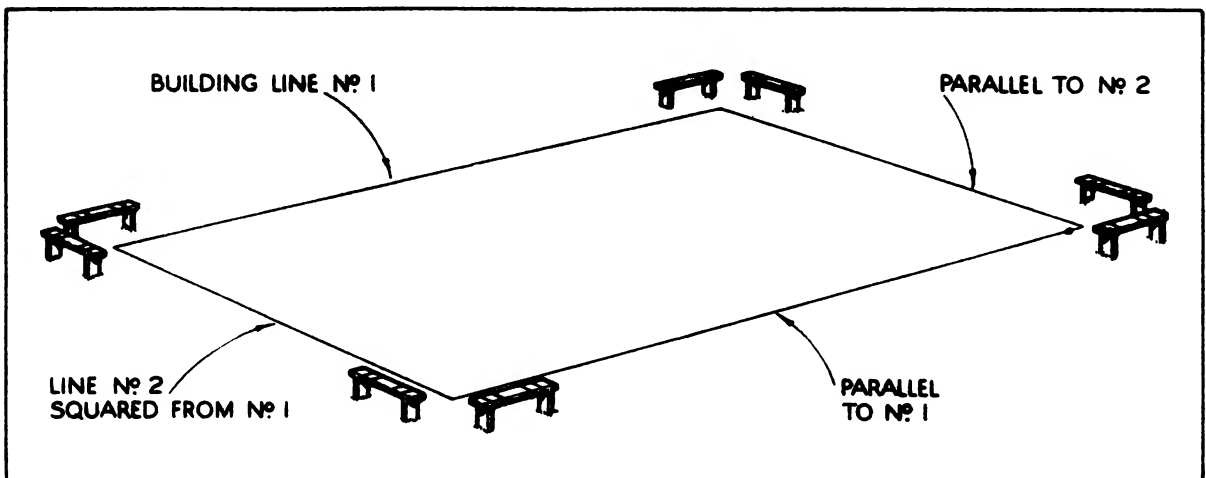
Erection of Batter Boards Surrounding the Foundation Area.
